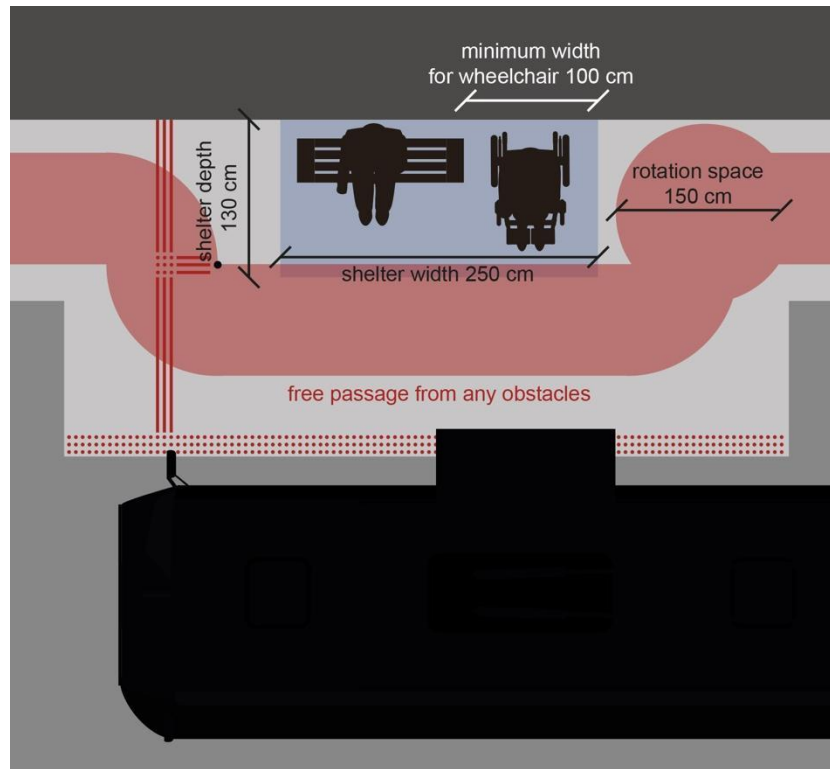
Plan diagram illustrating the proposed design for a bus stop shelter, where the sidewalk provides all the necessary space for the continuity of the pedestrian path and the protected resting area for pedestrians. The diagram includes the suggested minimum dimensions, checks for the continuity of pedestrian flow, and how the tactile paving should be implemented to mark the bus stop boundary and guide pedestrians to the informative signage. (Authors' work)
